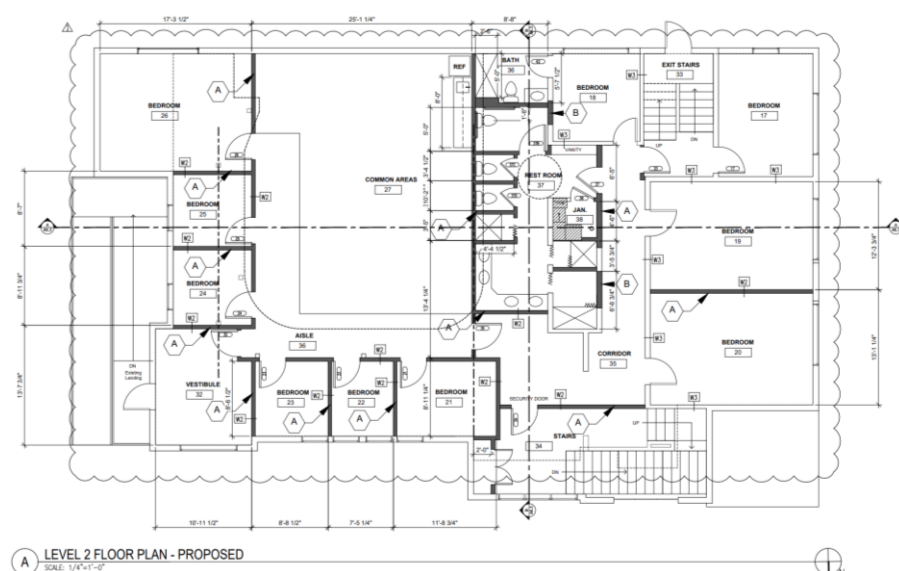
Level 2 floor plan for church conversion in Port Orchard. Note: this floor plan would not meet the co-living model code provisions requiring a shared kitchen on every floor sleeping units under 300 sf.
